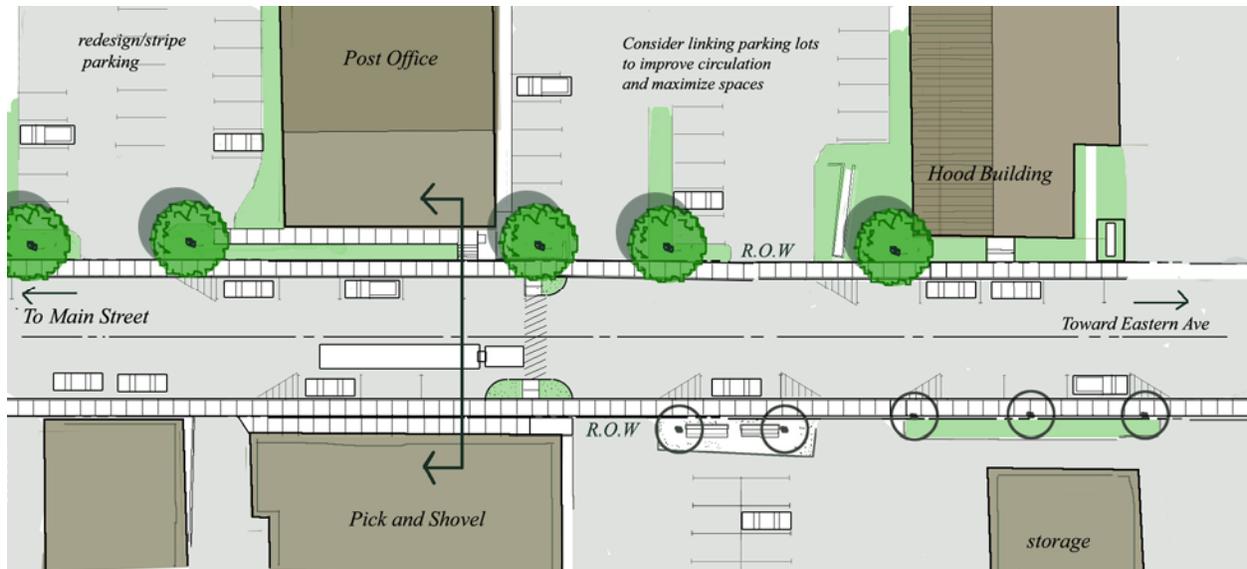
COVENTRY PLAN WITH PARKING ON BOTH SIDES
